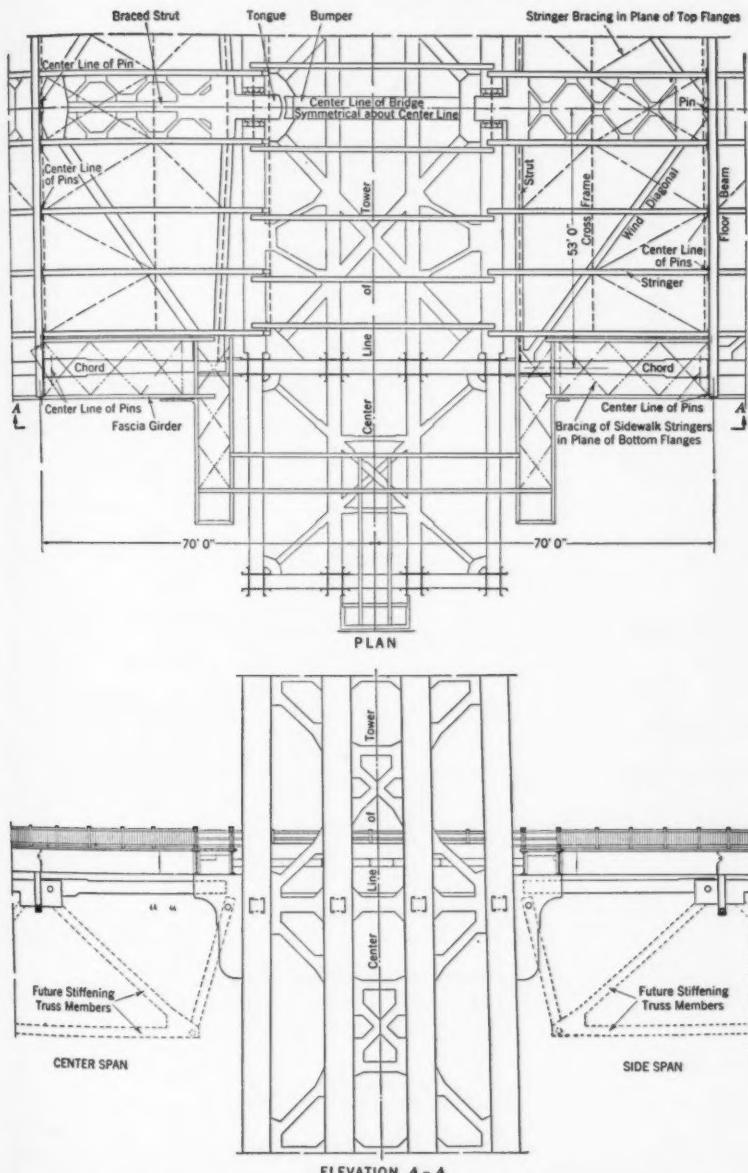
FLOOR FRAMING AT TOWER, GENERAL PLAN AND ELEVATION.
